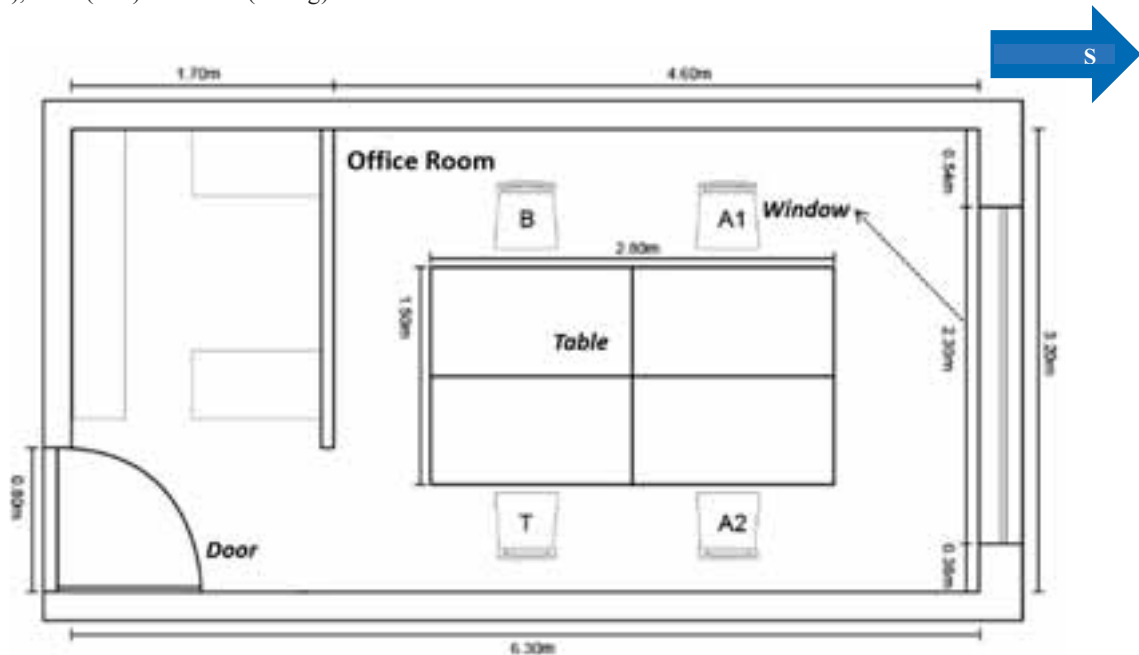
Plan, dimensions, and sitting positions of the office room studied
